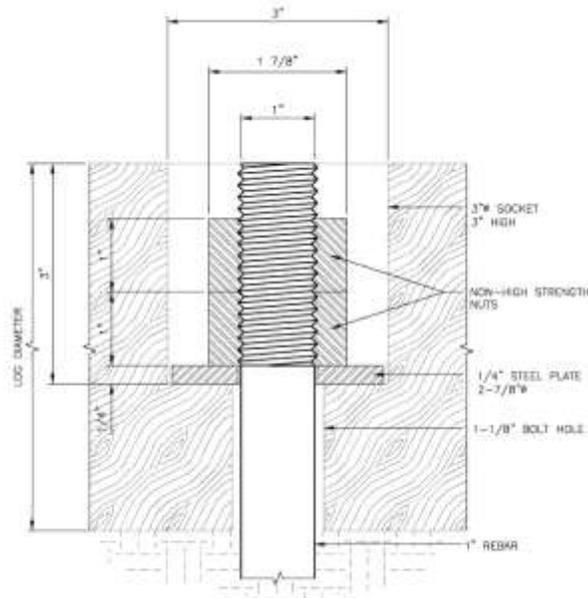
Typical Design of Bolt Connector for Log Anchors
